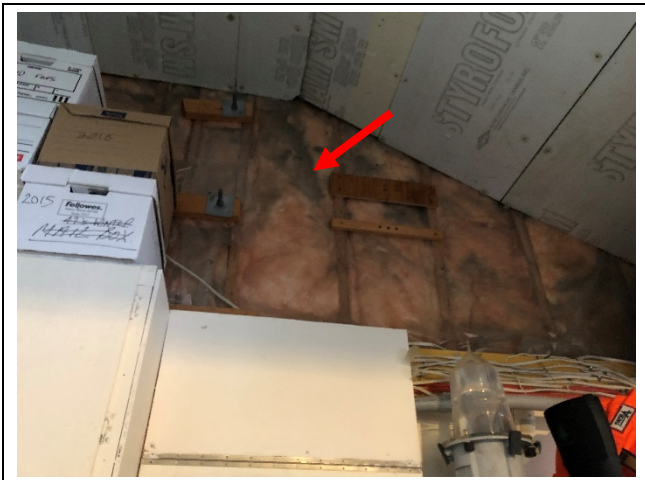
Office Building – Water damaged fiberglass wall insulation in the locker room area.
